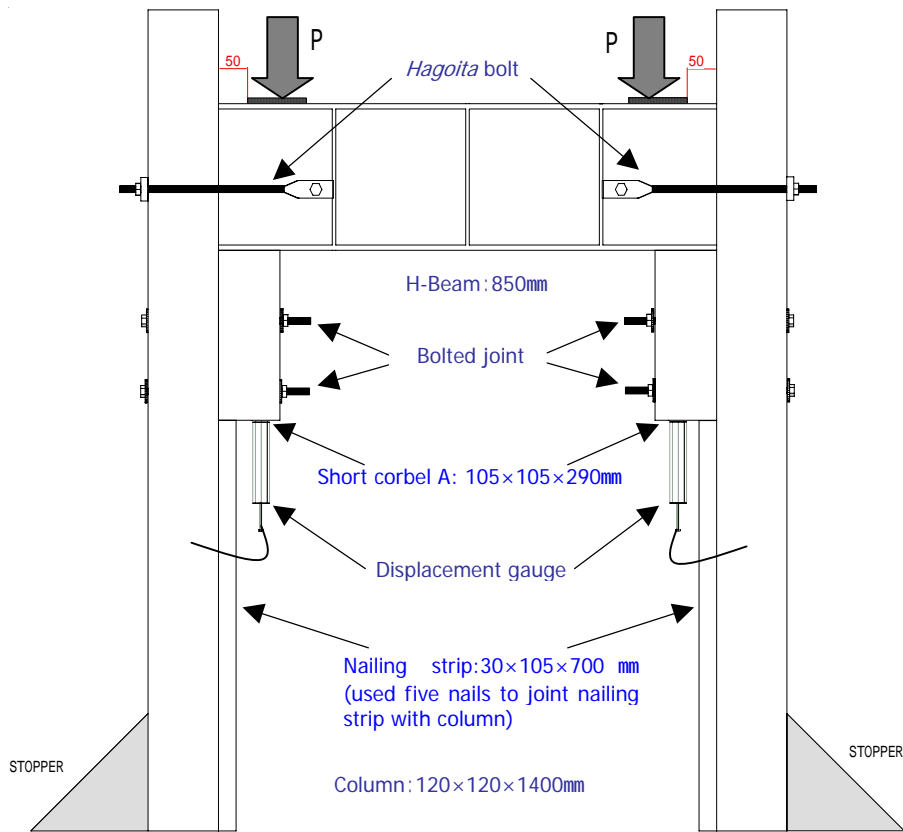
Loading apparatus of the Column-Beam joint test (test type of Corbel A-2 or A-4)
